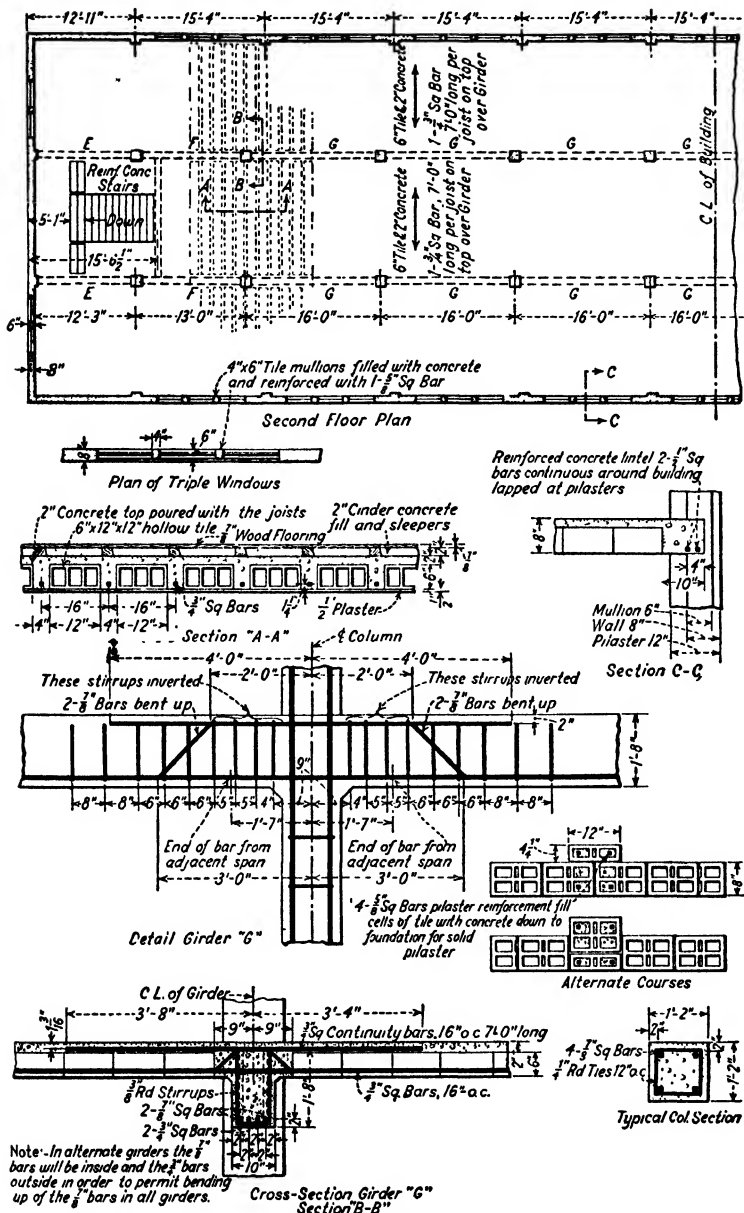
Floor Construction in Ordnance Building, Washington, D. C.
